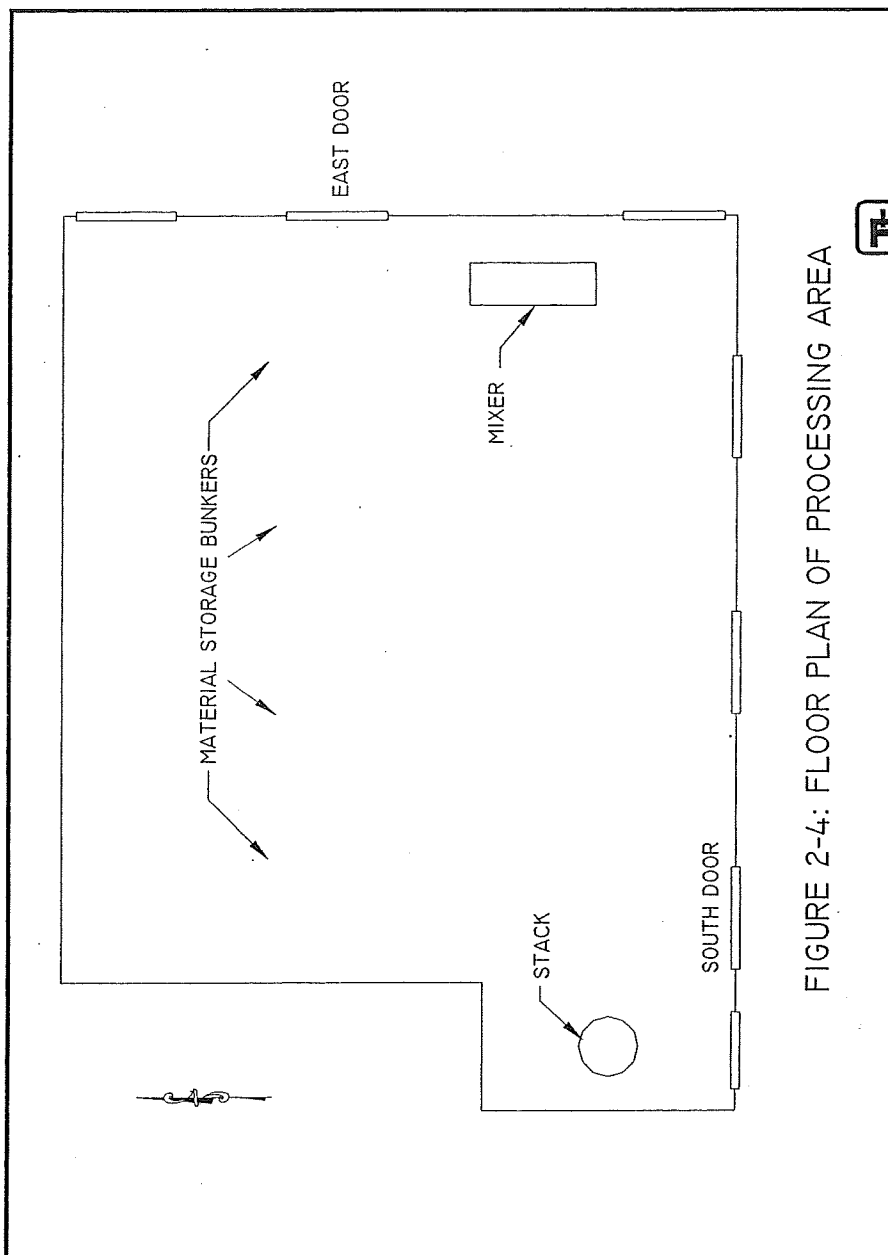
FLOOR PLAN OF PROCESSING AREA
